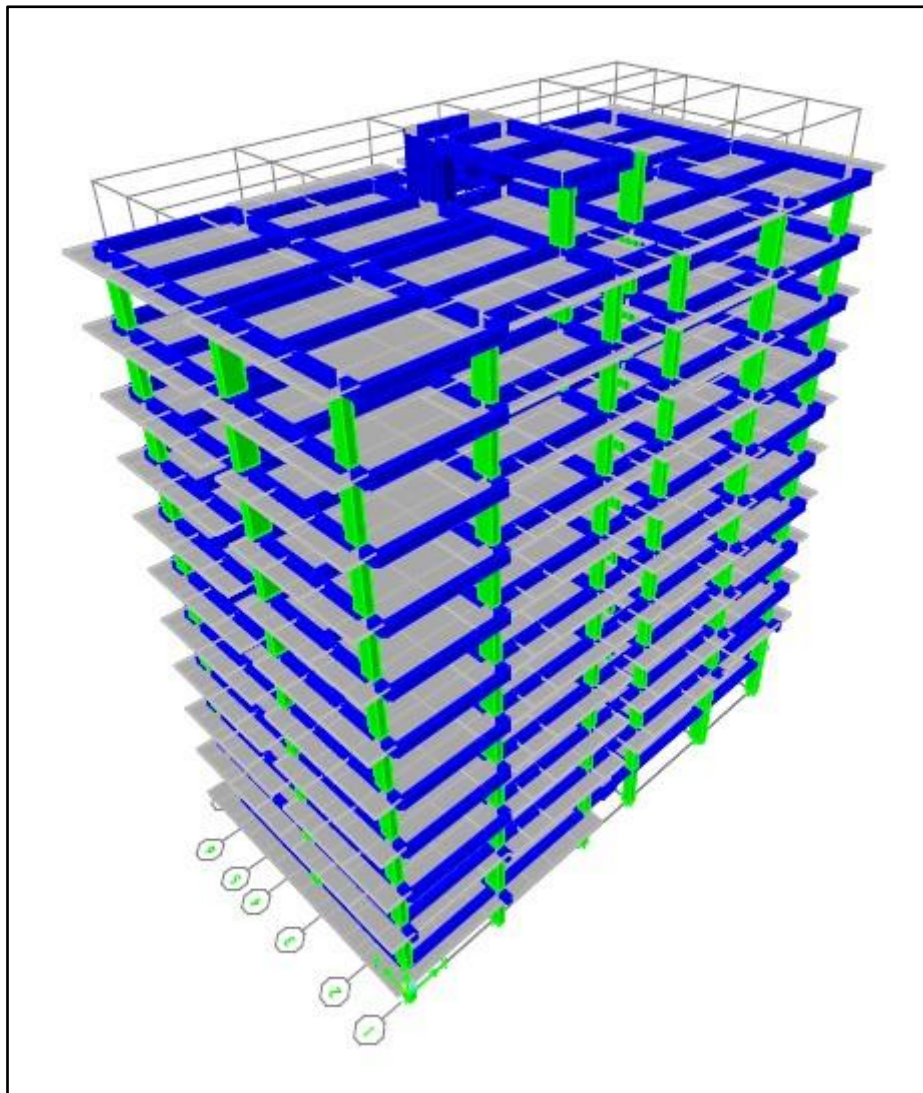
3D View of 10 Story (G+9) Residential Building
